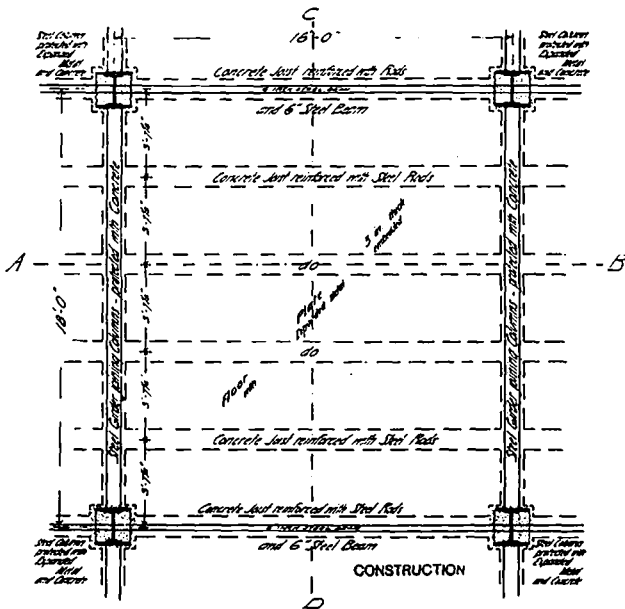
SECTIONAL DIAGRAM OF TYPICAL BAY, OGILVIE BUILDING, TORONTO, SHOWING END SECTIONS OF COLUMNS AND THE ARRANGEMENT OF CONCRETE JOISTS, STEEL GIRDERS, TIE BEAMS AND STEEL COLUMNS TO EFFECT A PERFECTLY SECURE SYSTEM OF FRAME WORK. FIGS. 14 AND 15 ARE DESIGNATED AS A-B AND C-D RESPECTIVELY.
